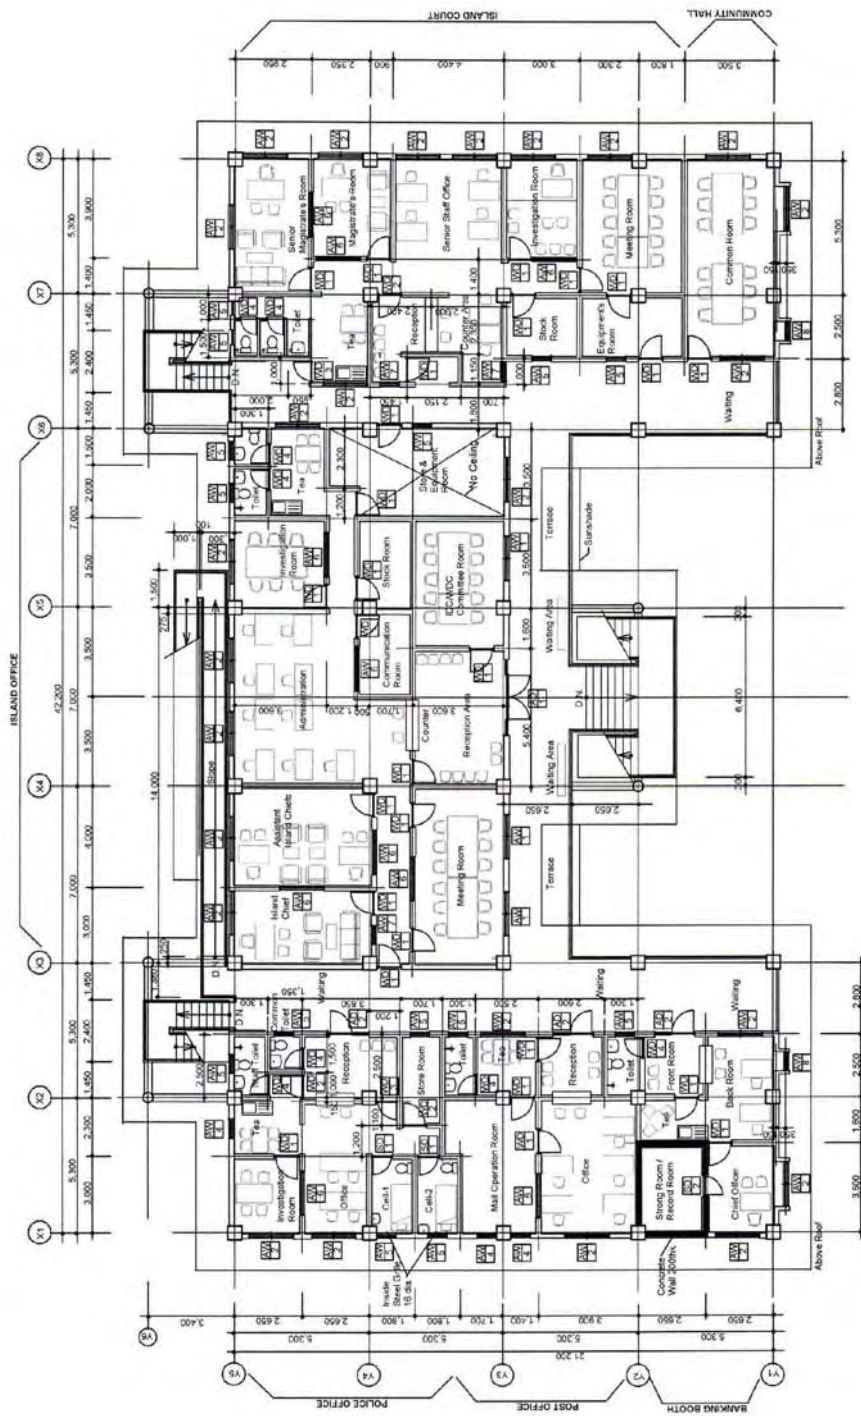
Floor Plan (1F) of Multi-purpose Building
